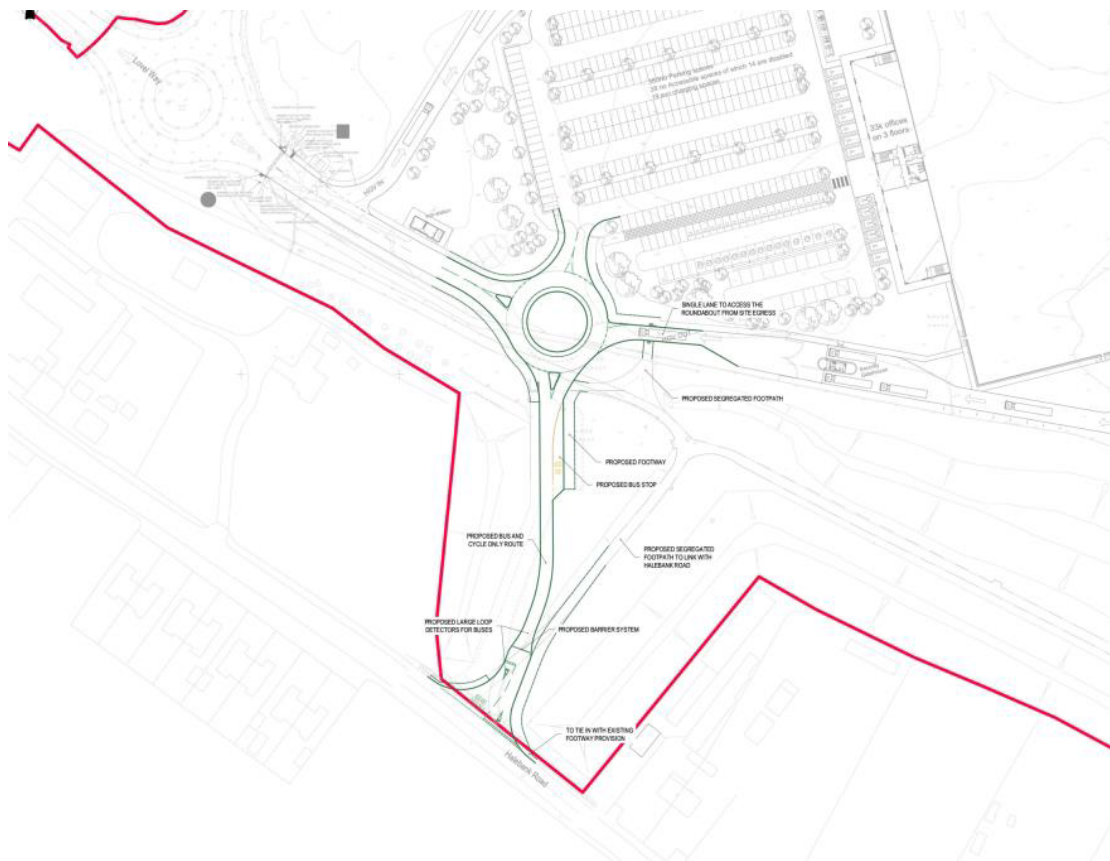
Proposed Access Arrangements (Drawing No. 8091-CUR-00-XX-DR-TP-75001-P04)
